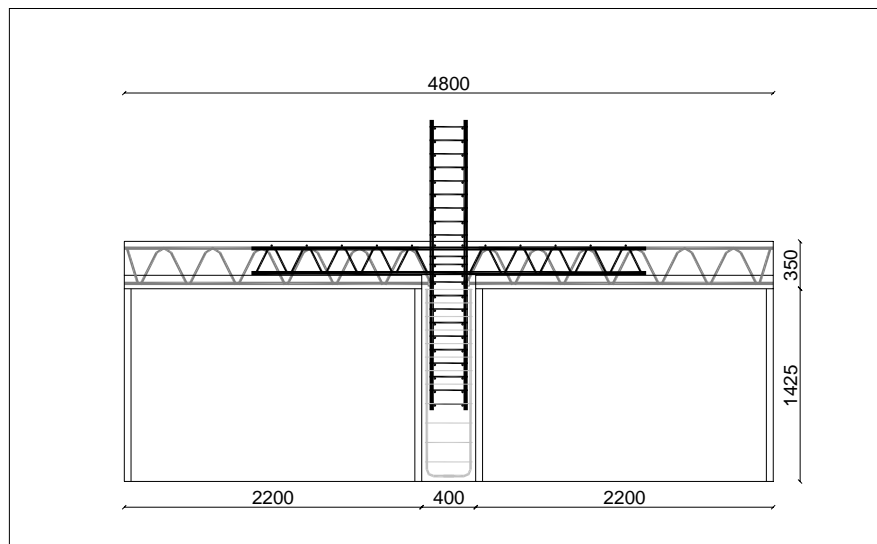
Floor concrete cast after the integrative truss positioning
